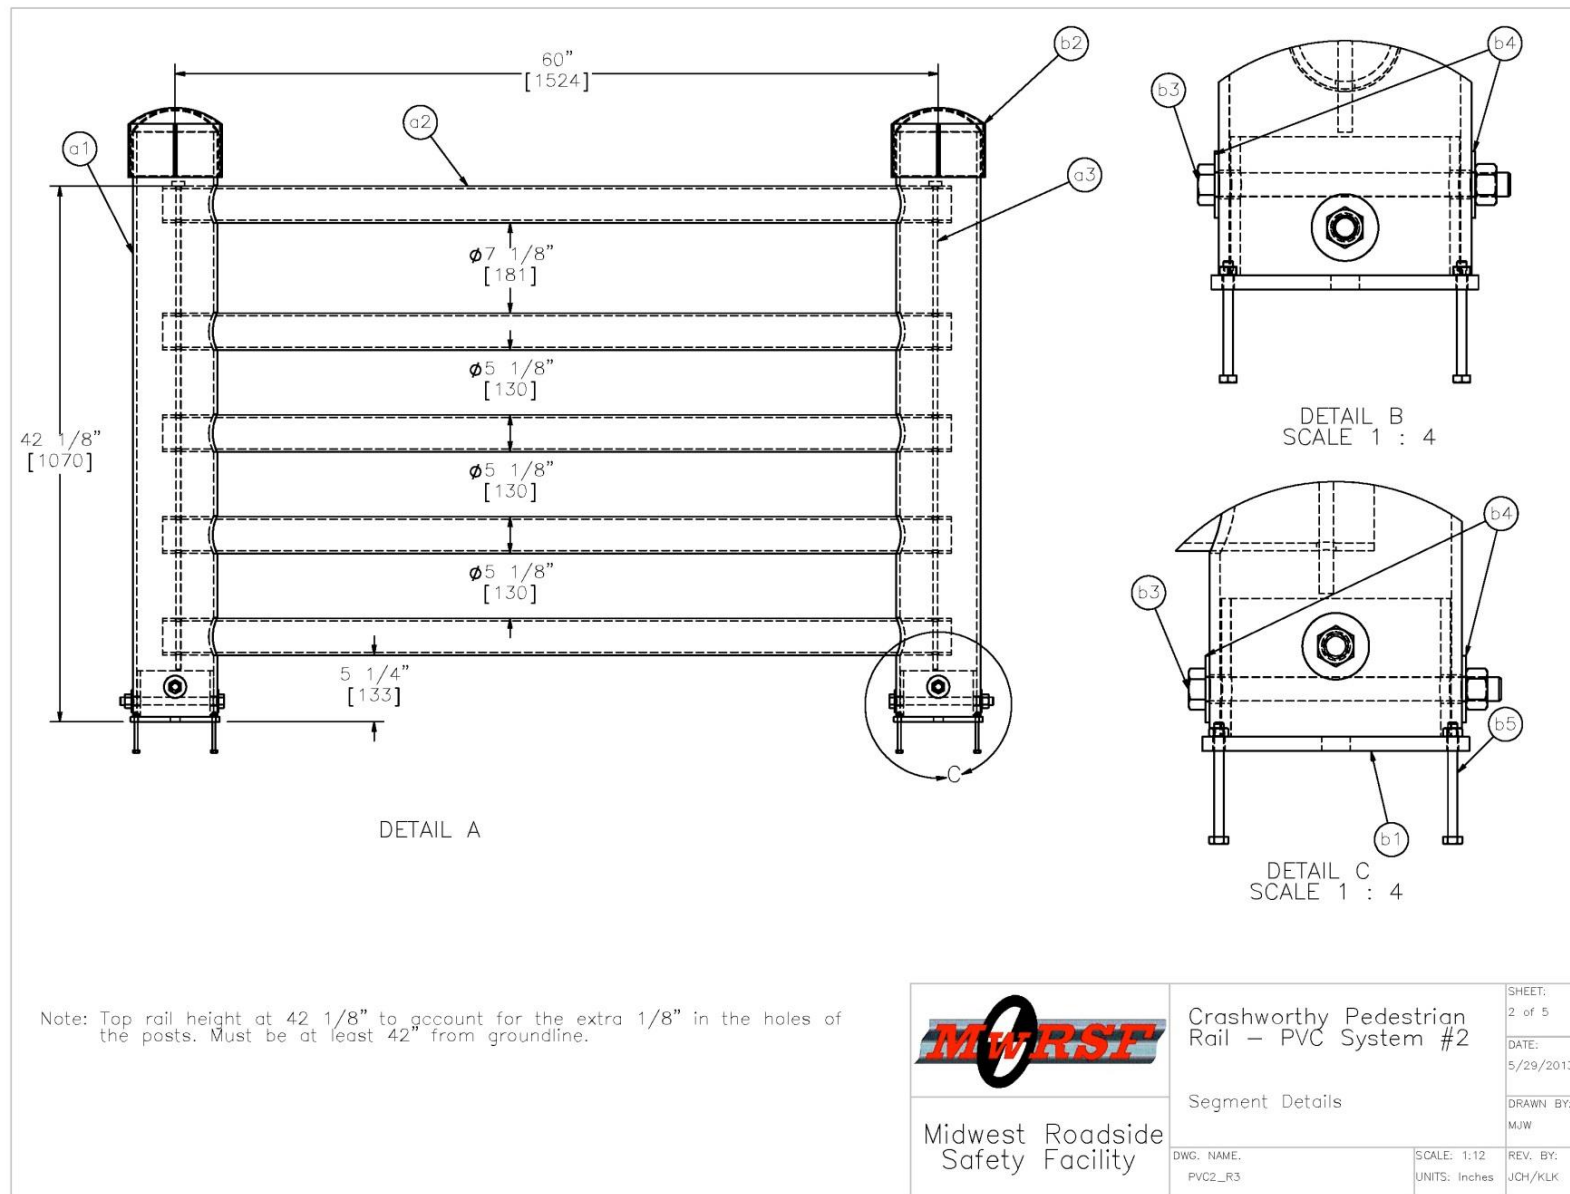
Modular PVC Rail, Design Concept PVC2-b (Sheet 2 of 5)
